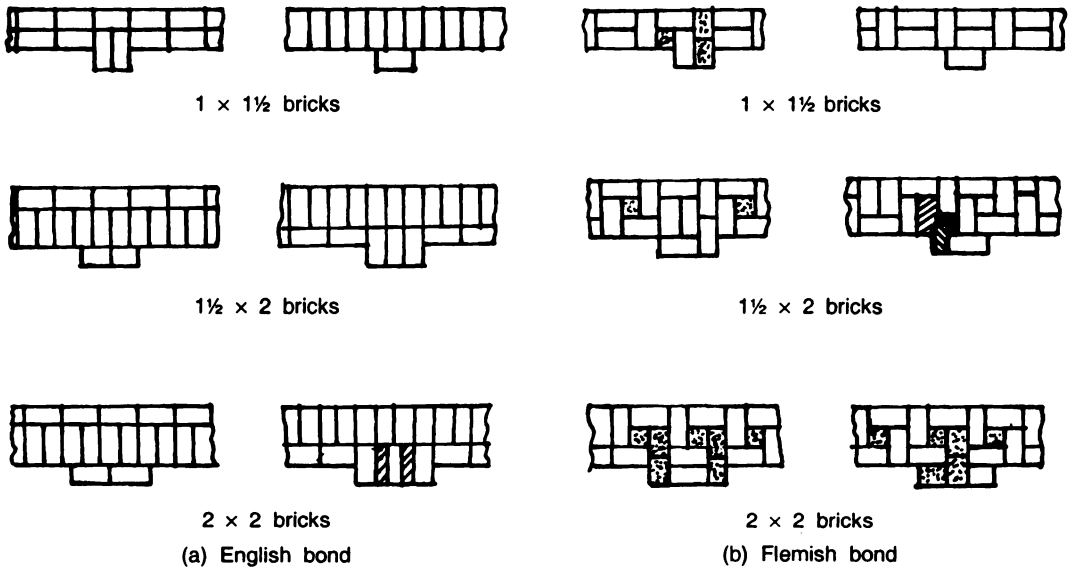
Construction of pilasters (piers attached to walls) shown in alternate courses.
